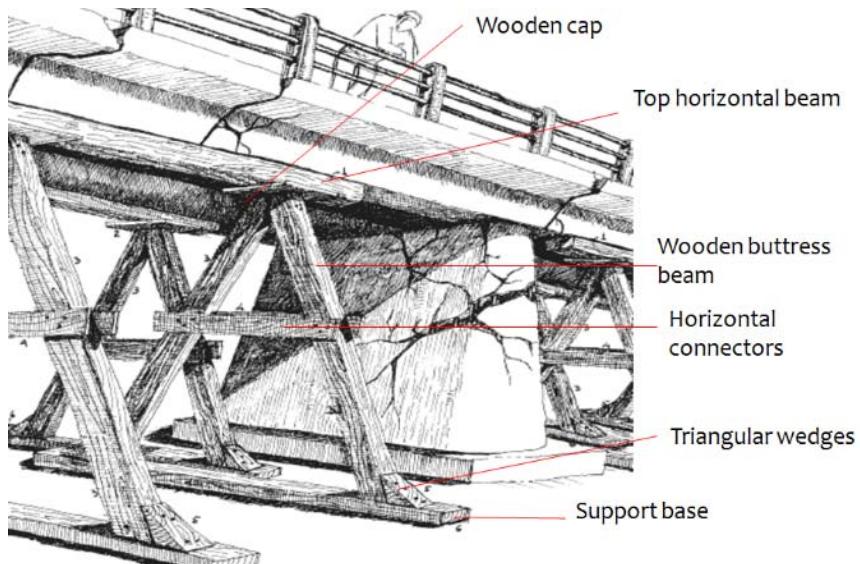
Multiple triangular propping with wooden beams (EPPO, 2000)
